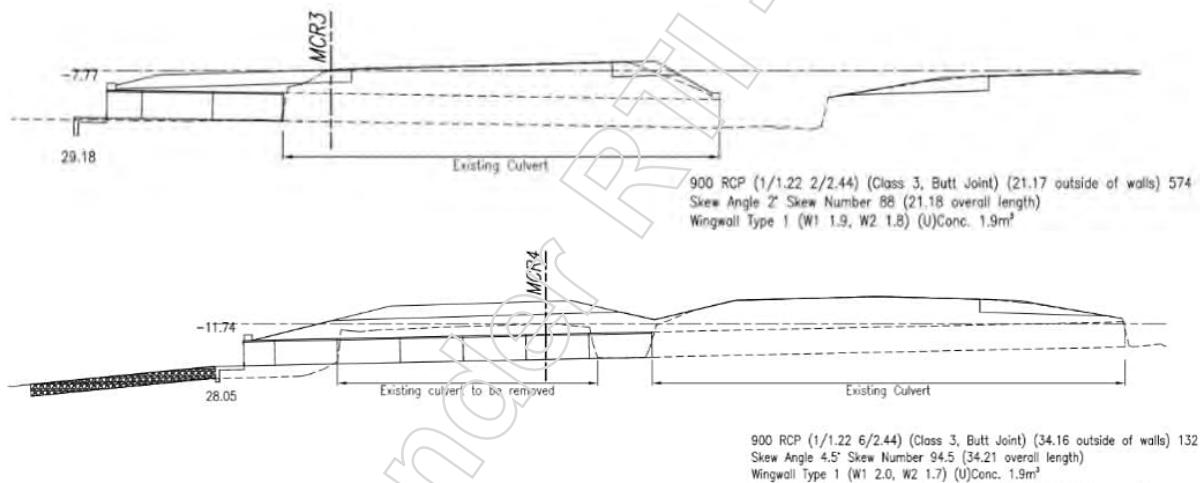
Existing CU2-29500 RCP culvert – top R3-2 (upstream) and bottom R4-1 (downstream)
